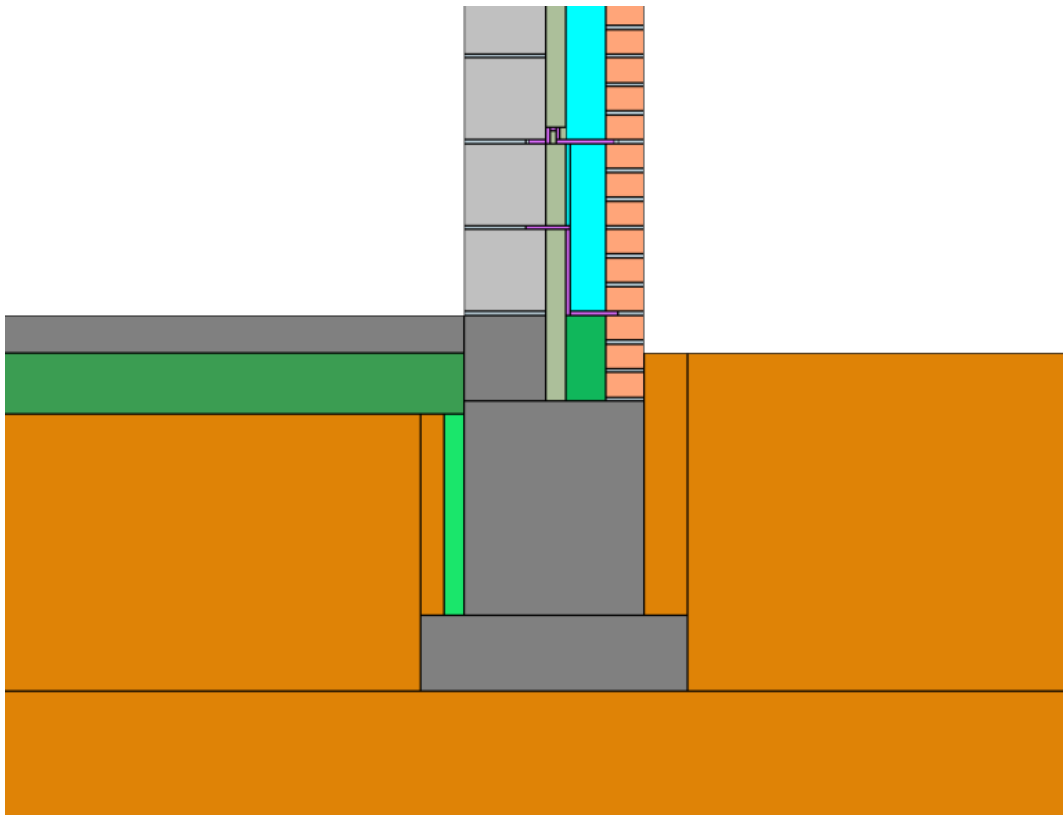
HEAT3 Bldg 1444 foundation model. Bricks, CMUs, cast concrete and a rigid insulation have been implemented in the wall section, as indicated in the as-built detail drawing.
